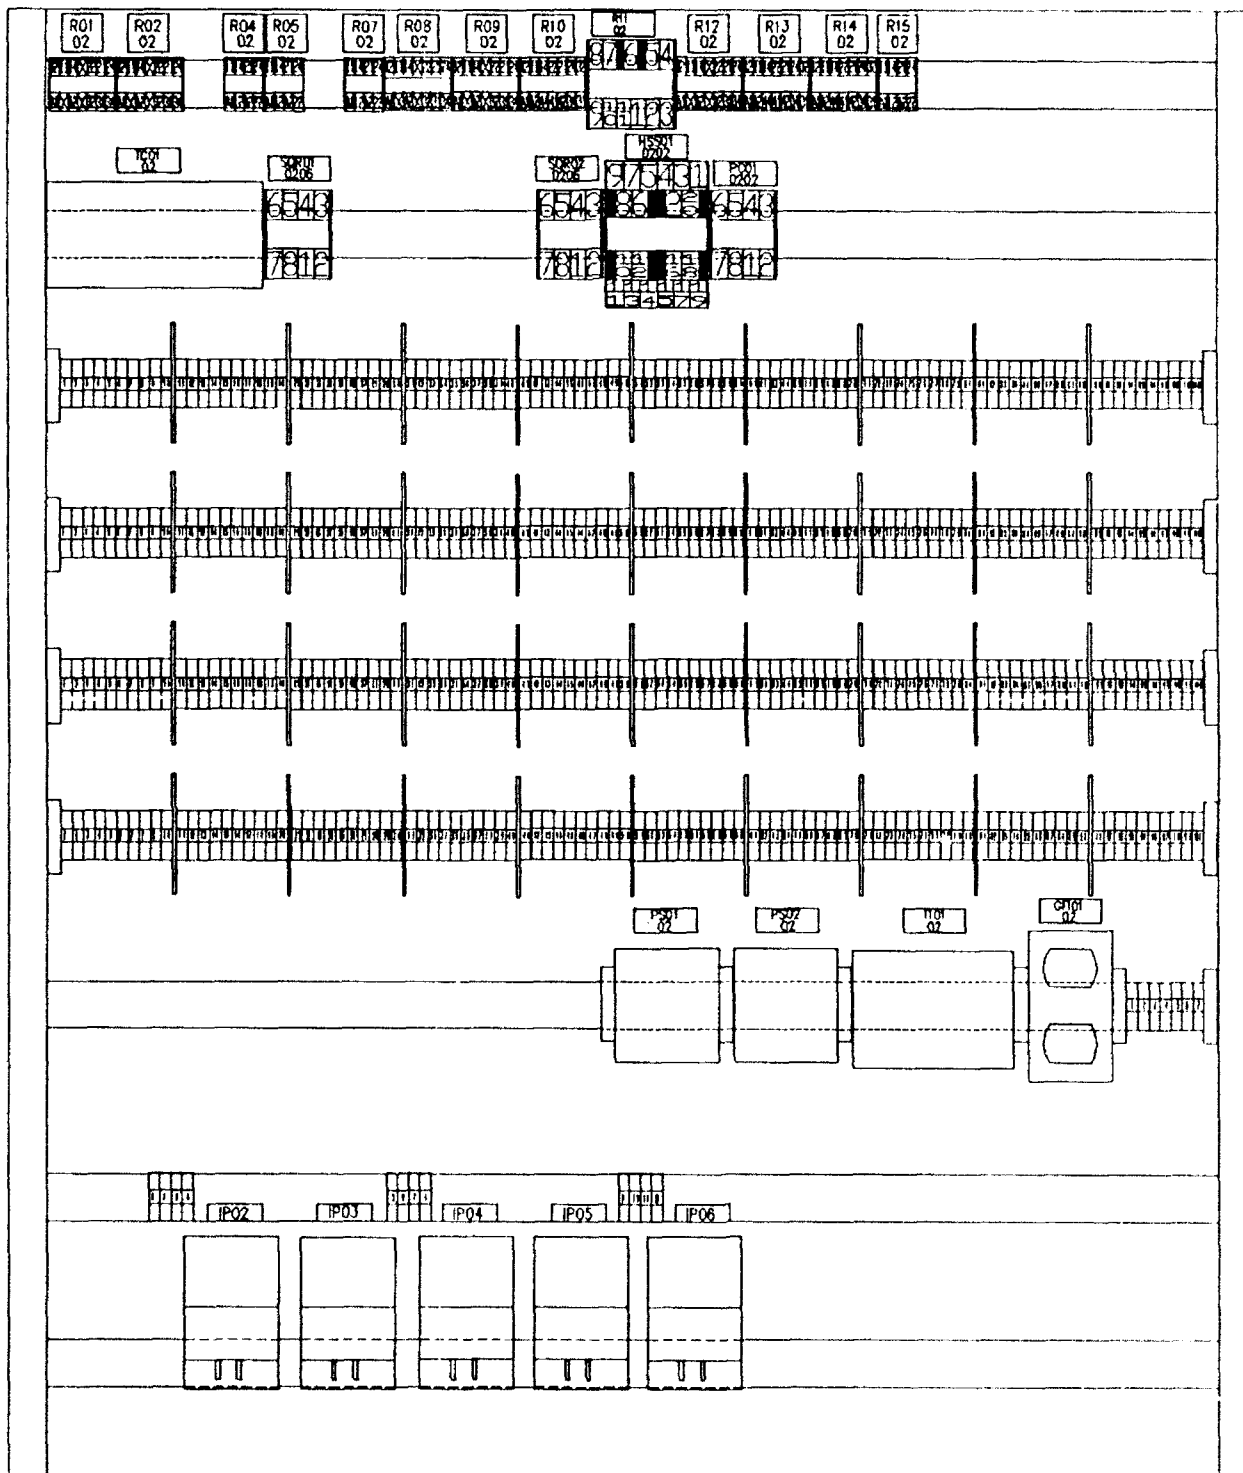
As-Built Back Plate Layout for Brown Hall Control Panel.
